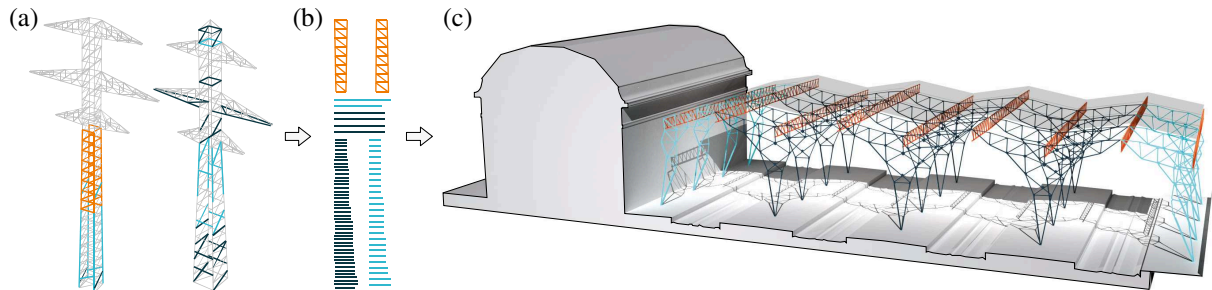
(a) Suspension and anchor pylon, (b) reused members, (c) final structural system.
